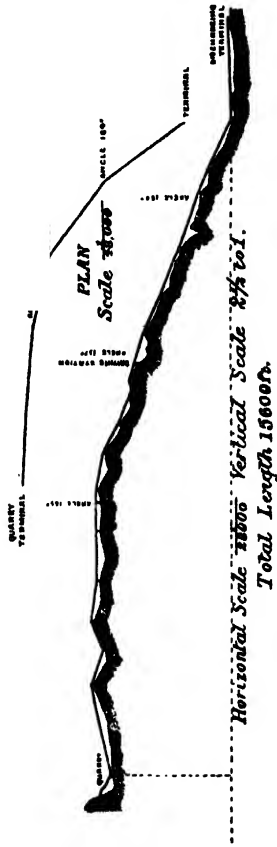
Installation at a Quarry at Madras, India: Section and Angle Plan.
